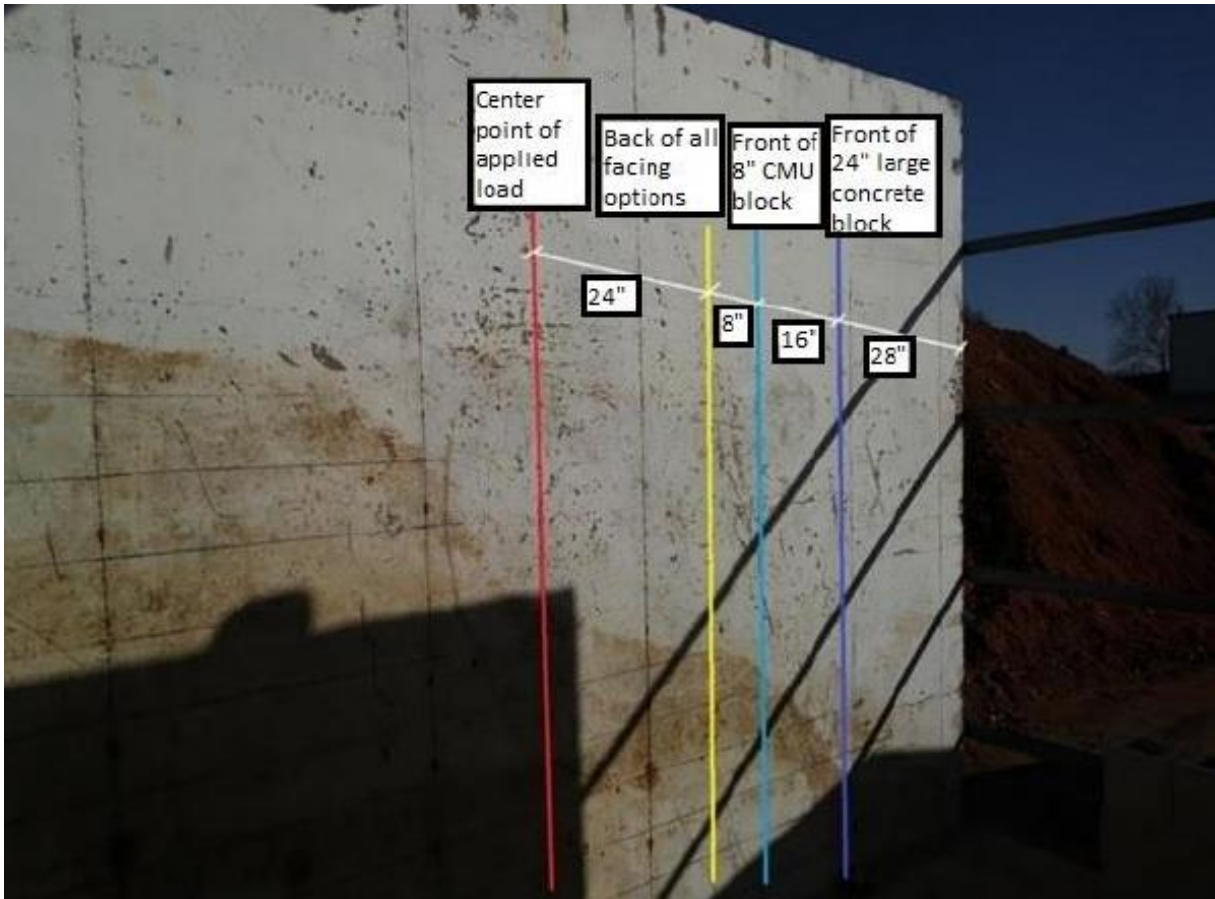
Locations of facing elements projected on the sidewalls of the test station (image provided by Doger, 2020)
